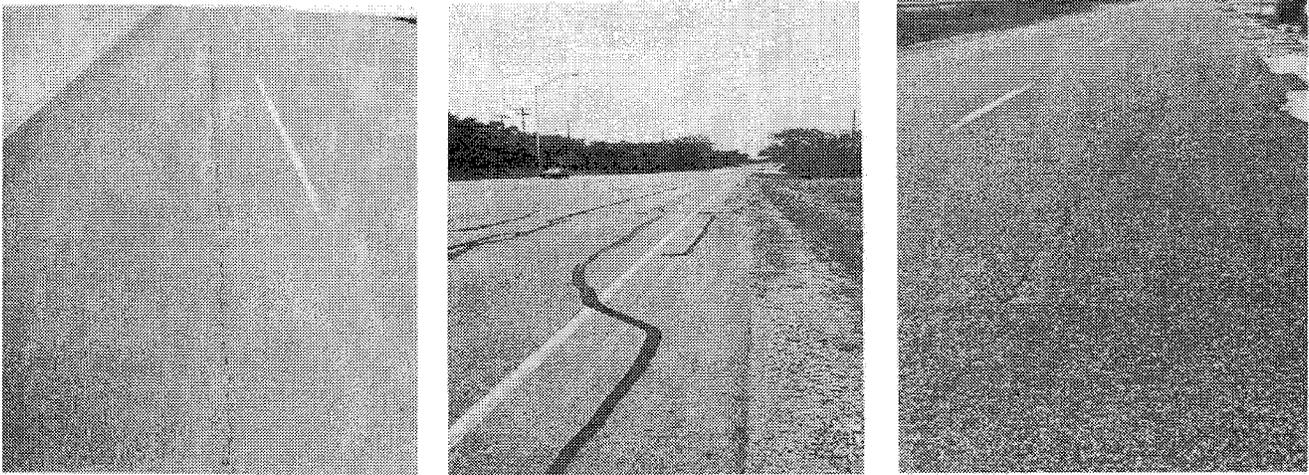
Examples of Longitudinal Cracking (TxDOT 1998)
